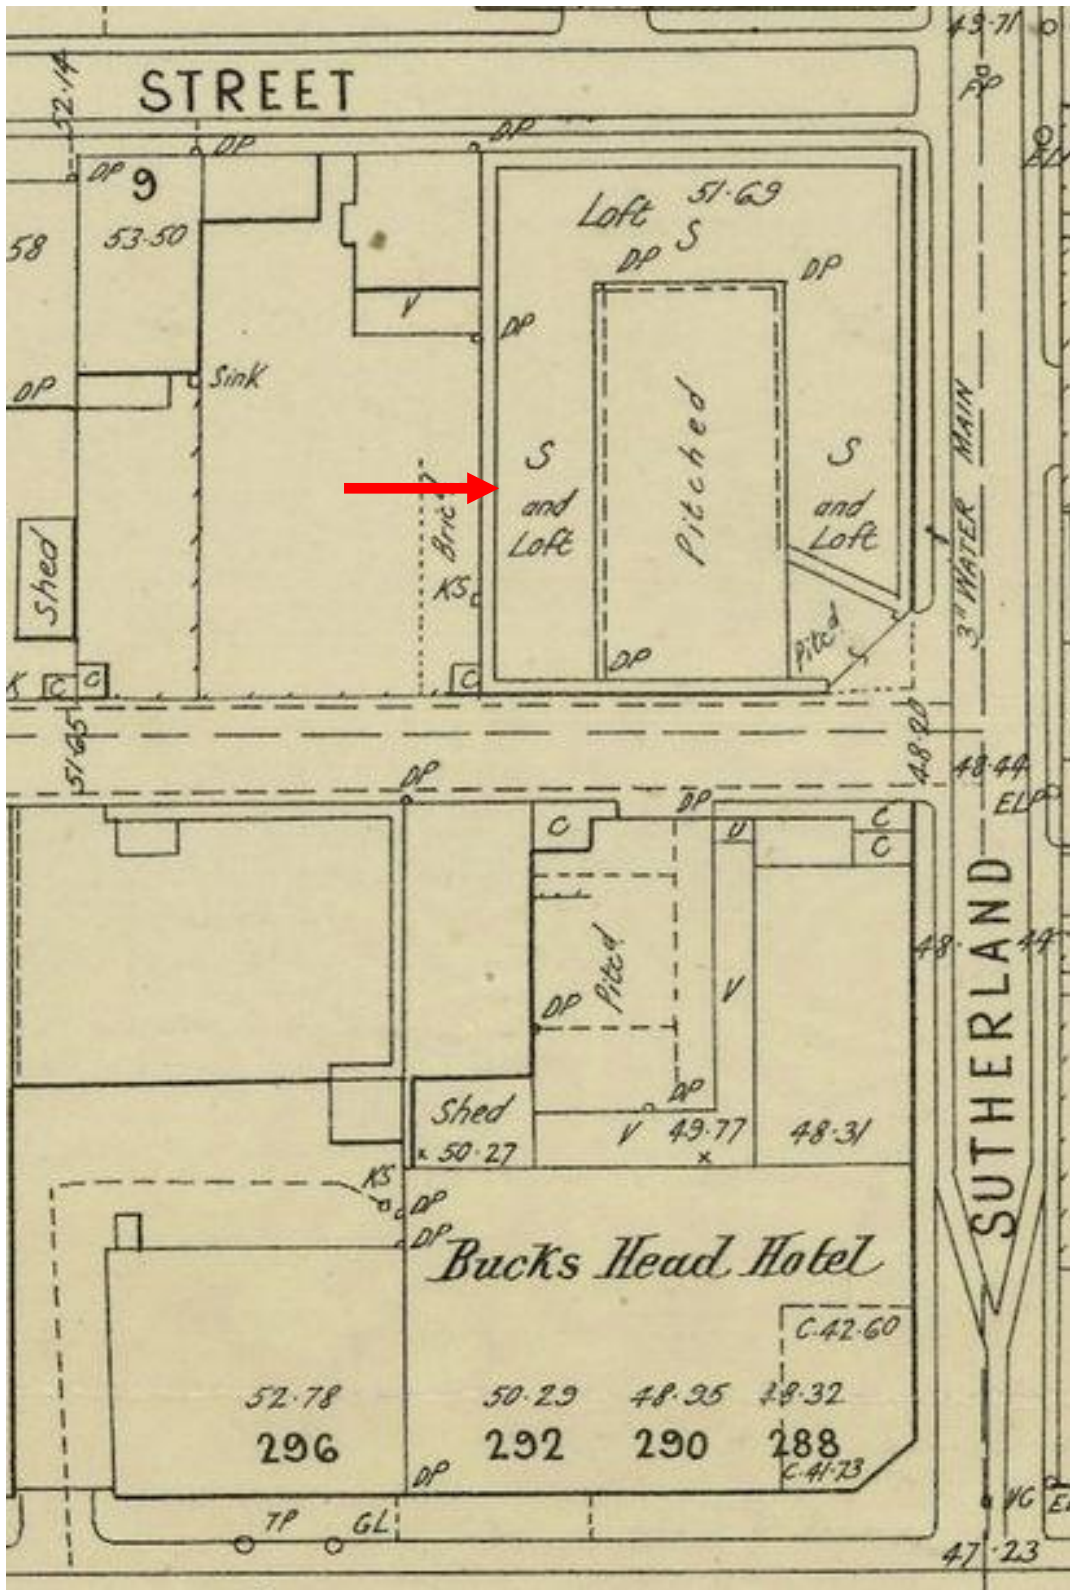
MMBW detail plan 1017, 1894, with Bucks Head Hotel at bottom and the stables to the north (indicated); note the central pitched yard and the U-shaped stables and loft building
